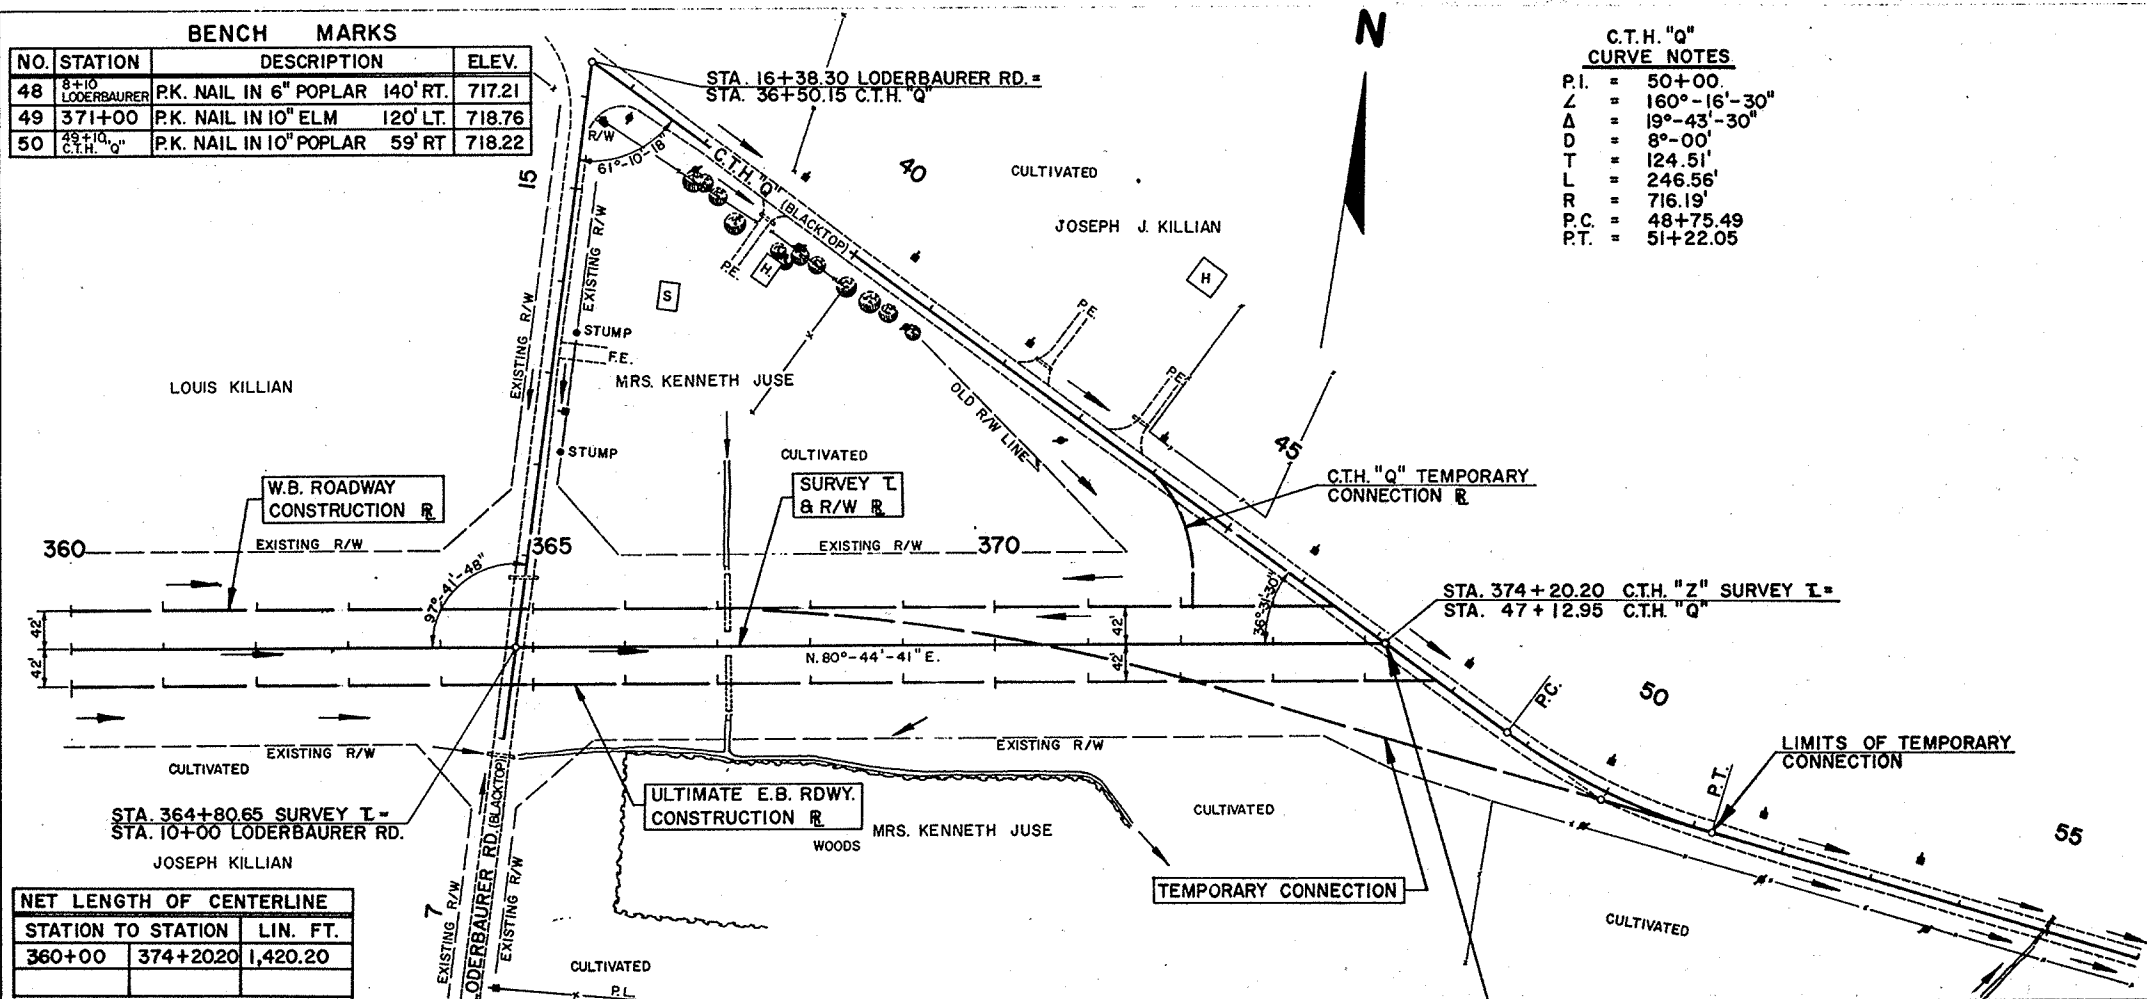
PLAN PROFILE OF P & R E STANDARD
